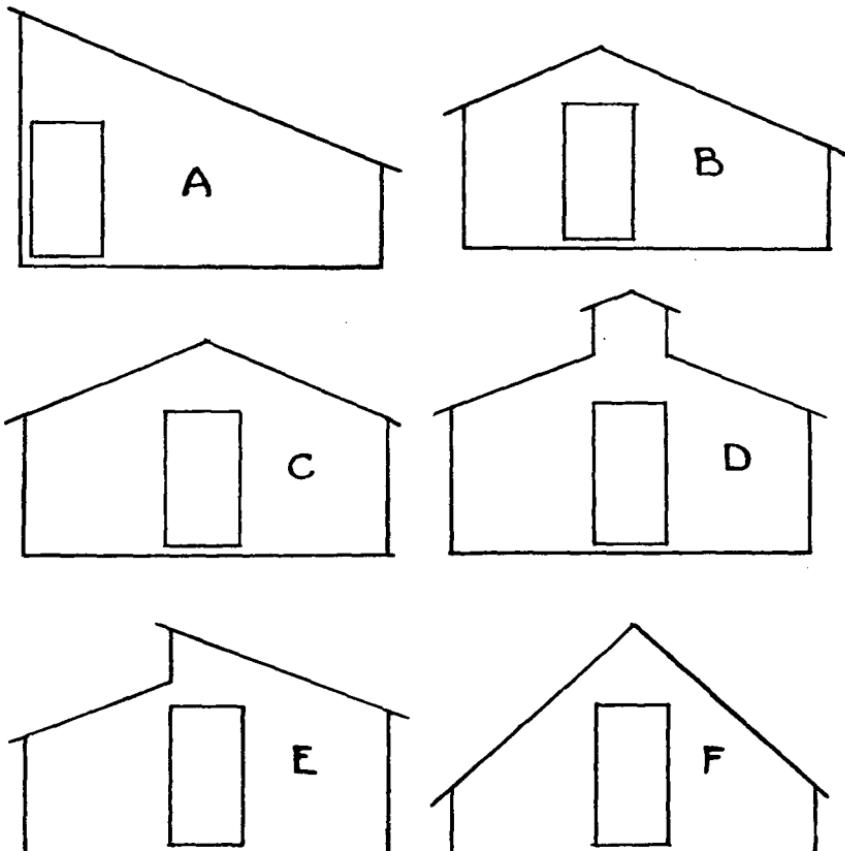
Types of roofs for poultry houses. A, shed-roof; B, two-thirds span; C, even-span; D, monitor; E, semi-monitor; F, A-shaped.
